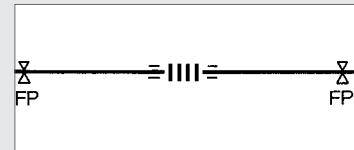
Straight pipe run with axial expansion joint and end anchors
